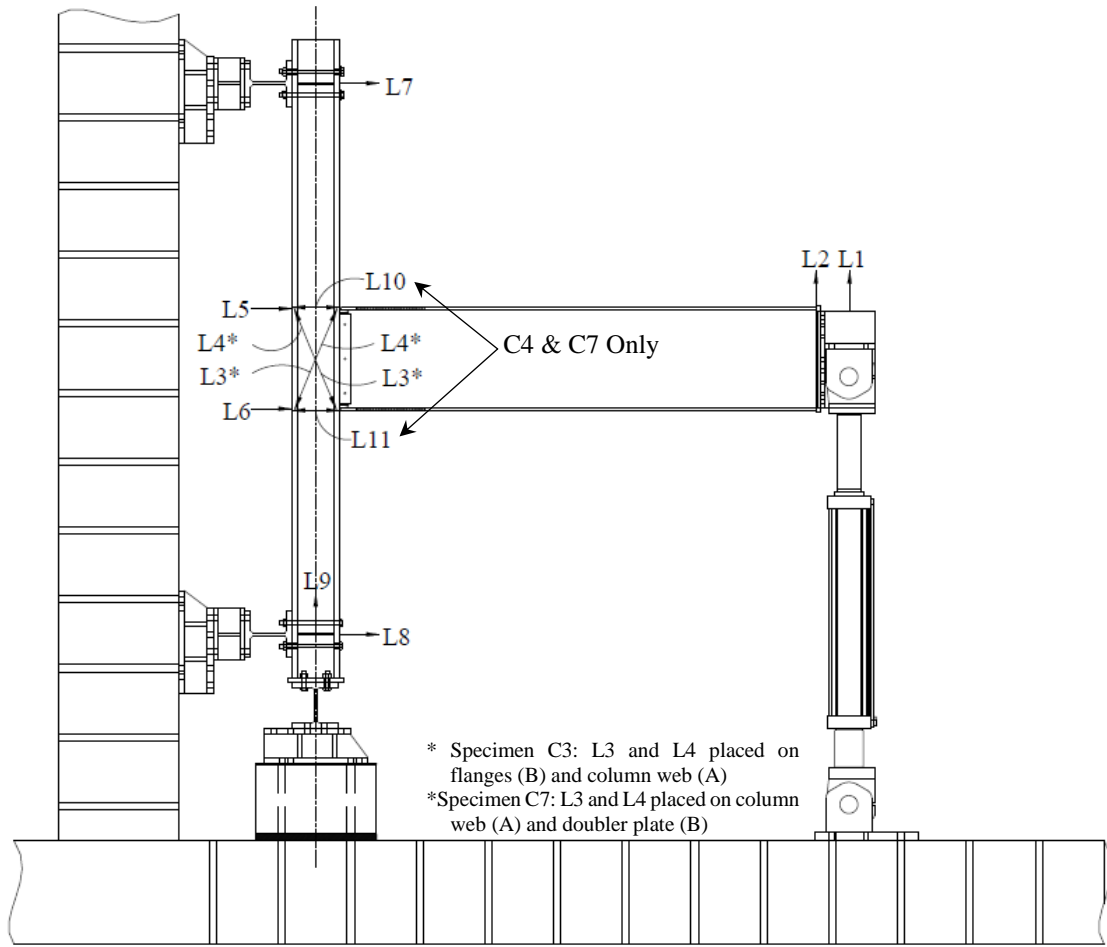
Exterior Moment Connection (Specimens C3 to C7) Transducer Layout
